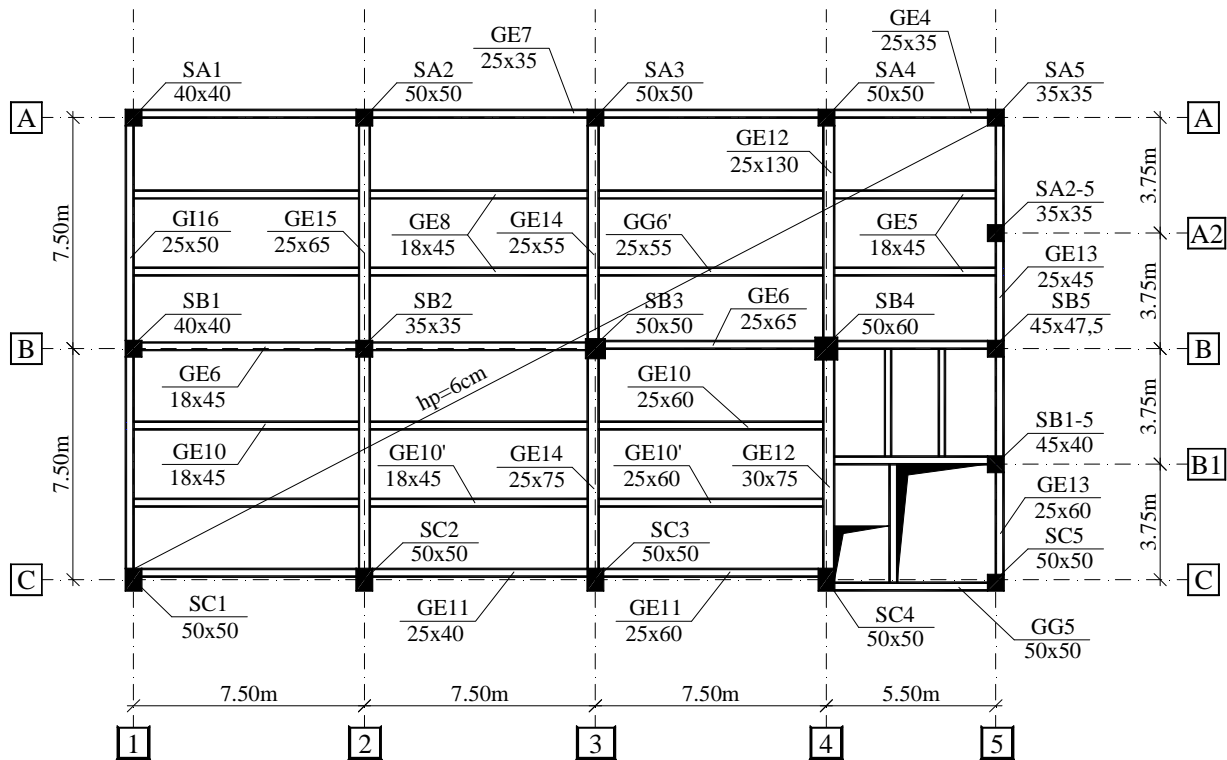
EXISTENT STRUCTURE: Framing plan level +18,40 m
